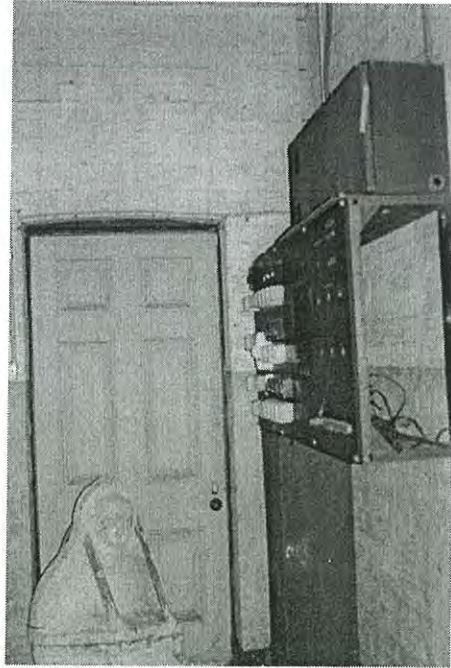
Interior, Passage (space T03). Note original six panelled timber door on north wall that leads to the Call Room (space CR01).
